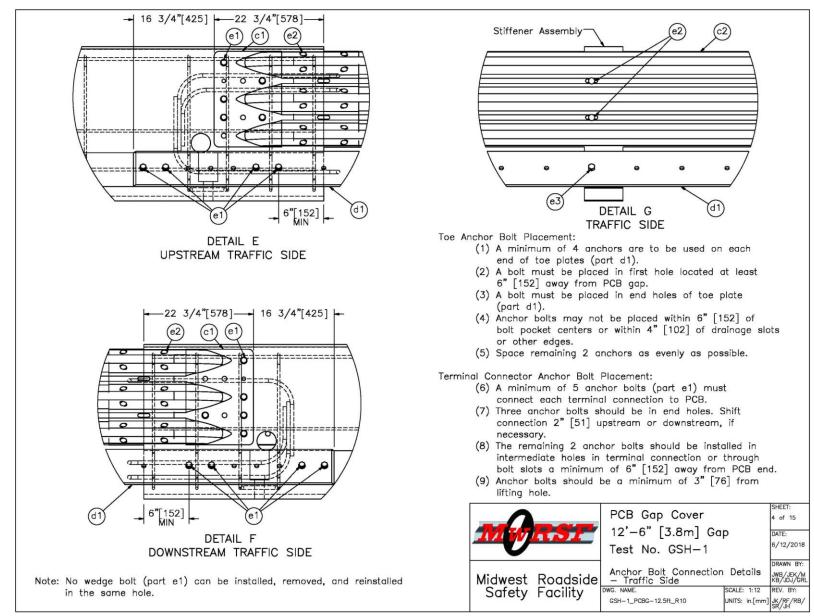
Anchor Bolt Connection Details – Traffic Side, Test No. GSH-1
